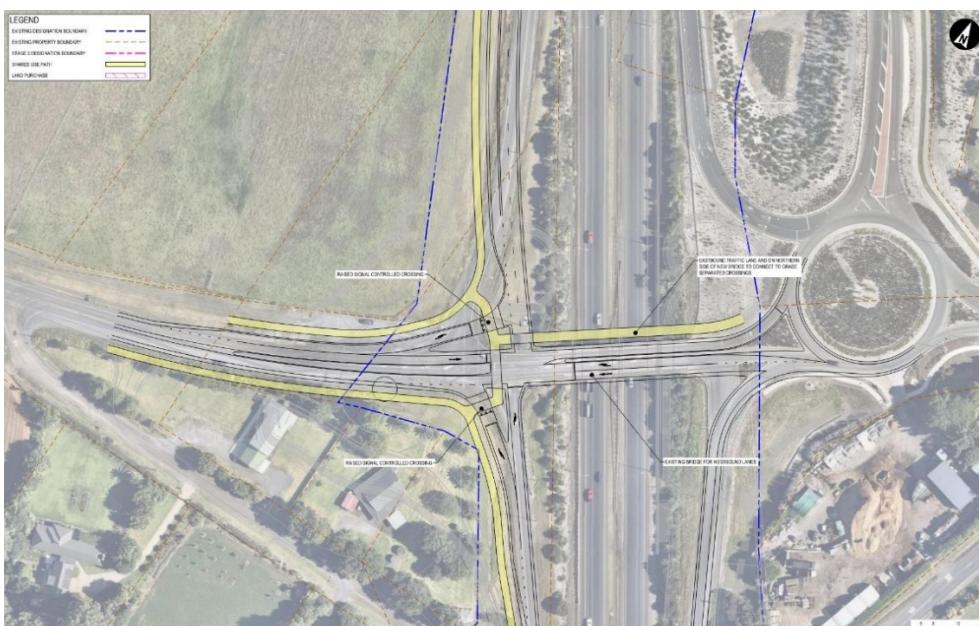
Ramarama Interchange: Option Two General Arrangement Plan
